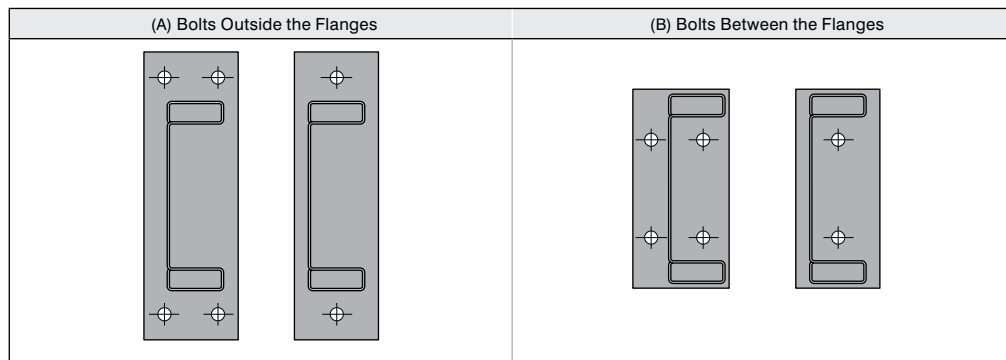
Alternative Bolt Arrangement for Bolted Moment End Plate
